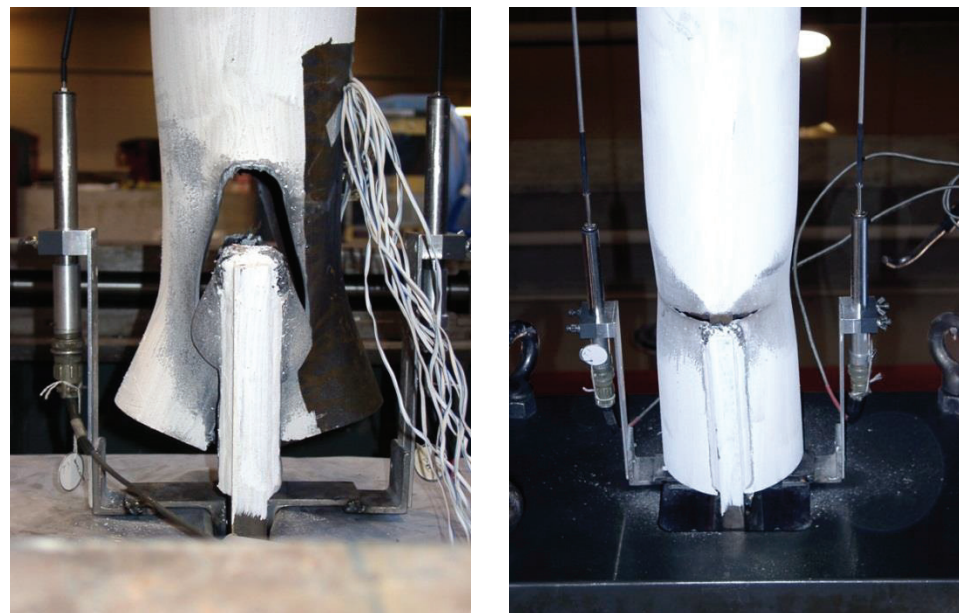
Typical slotted HSS-to-gusset connection failures: tear-out failure (left); net-section fracture (right) [images courtesy of the University of Toronto]
